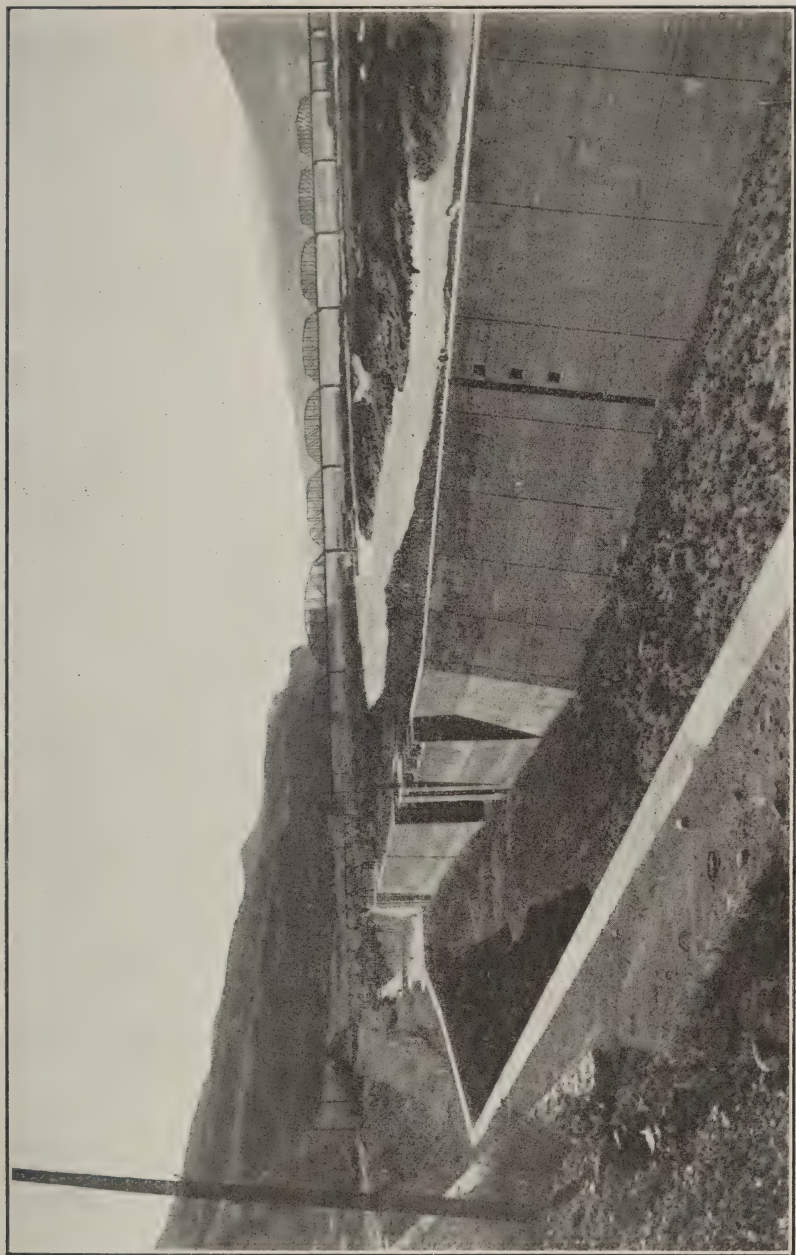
Looking west from point above boat basin, Celilo, showing Celilo Lock and Oregon Trunk Railroad Bridge across the Columbia.
